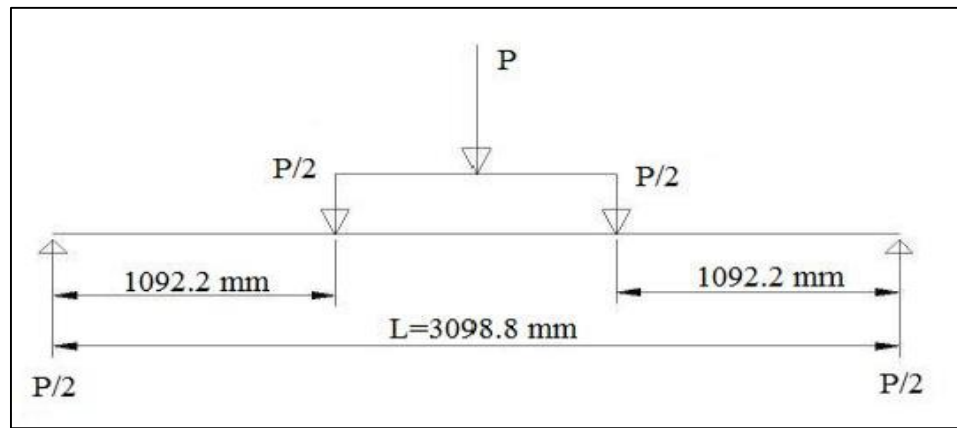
Schematic diagram of test setup (Source: Bajracharya et al. (2011))
